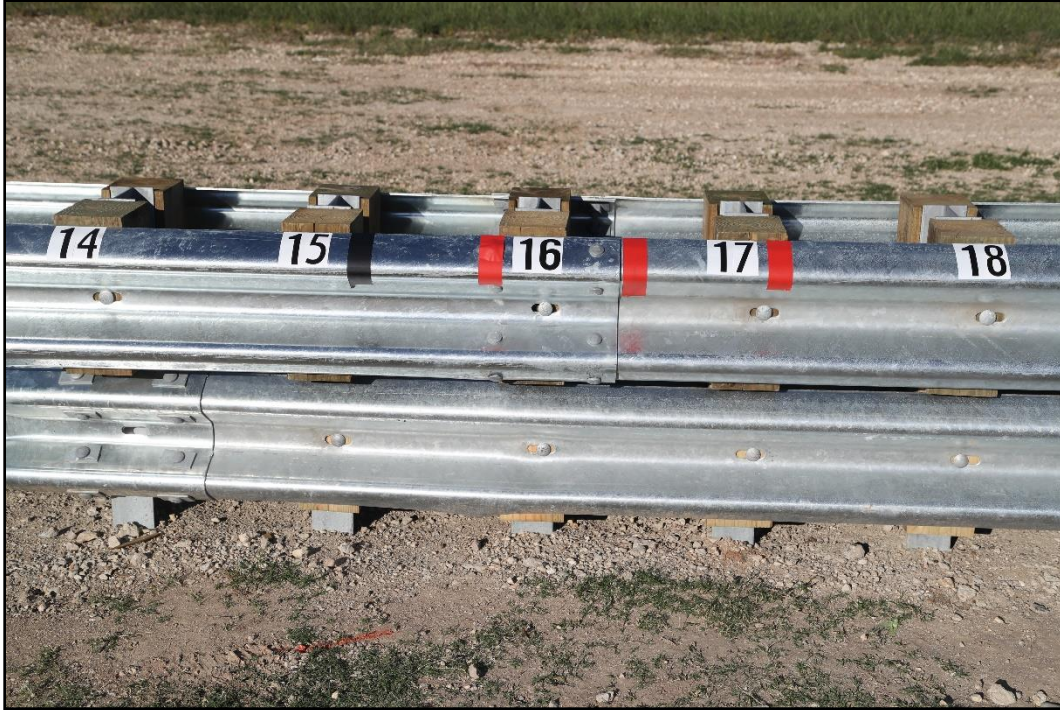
Close-up View of the Median Guardrail Transition to Median F-Shape Barrier at Impact prior to Testing.
